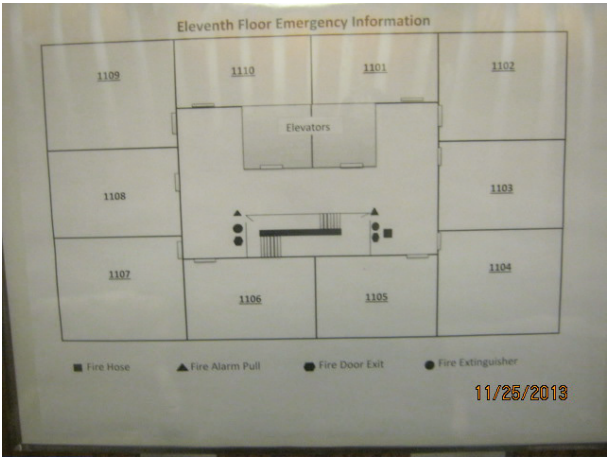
Fire escape plan posted in the hallway shows typical floor layout. There are 10 units per floor around the perimeter of the building and minimal corridor area in the center of the building. One supply register provides 100% outdoor air to make up for air exhausted from apartment units.
